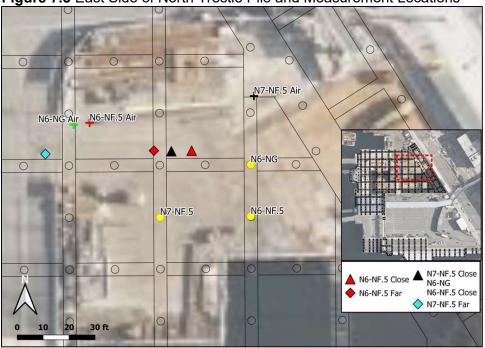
East Side of North Trestle Pile and Measurement Locations
